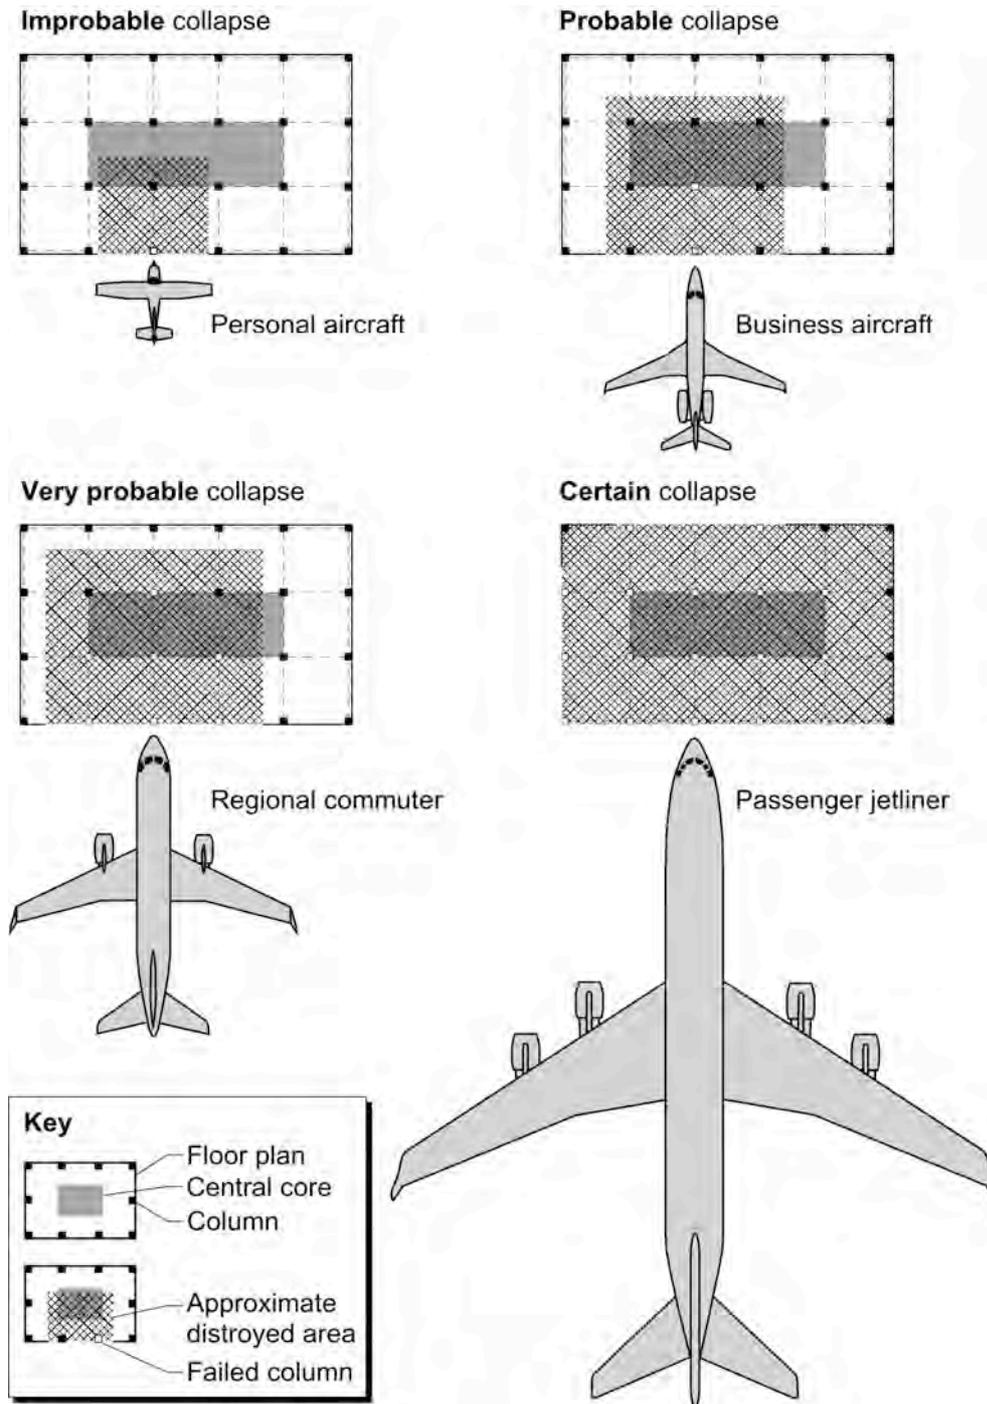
Structural damage and probability of building collapse for medium size high-rise buildings
